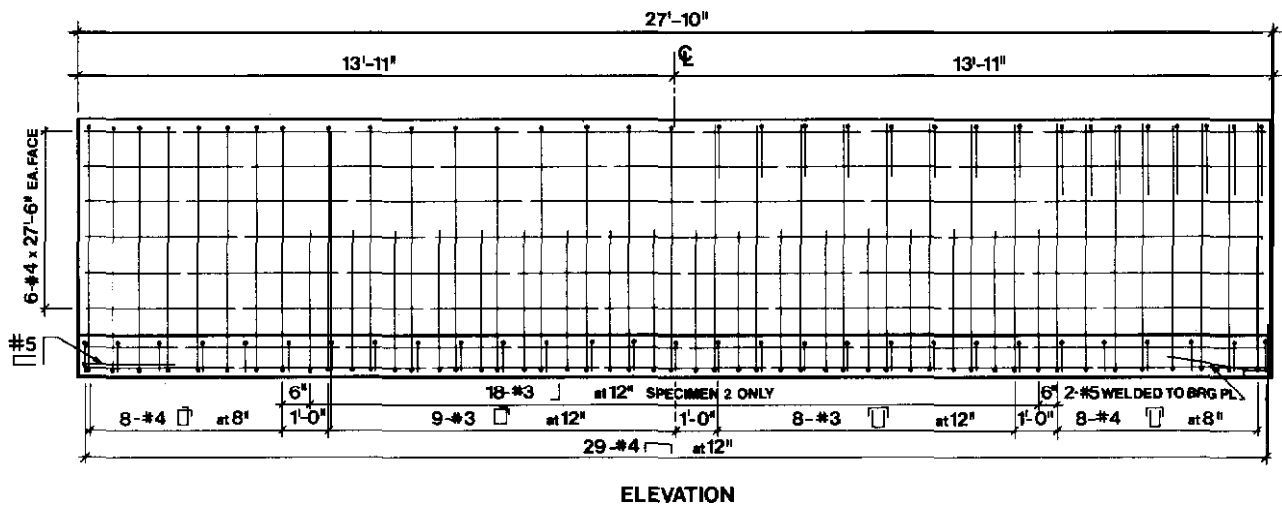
Dimensions and details of Specimens 1 and 2
